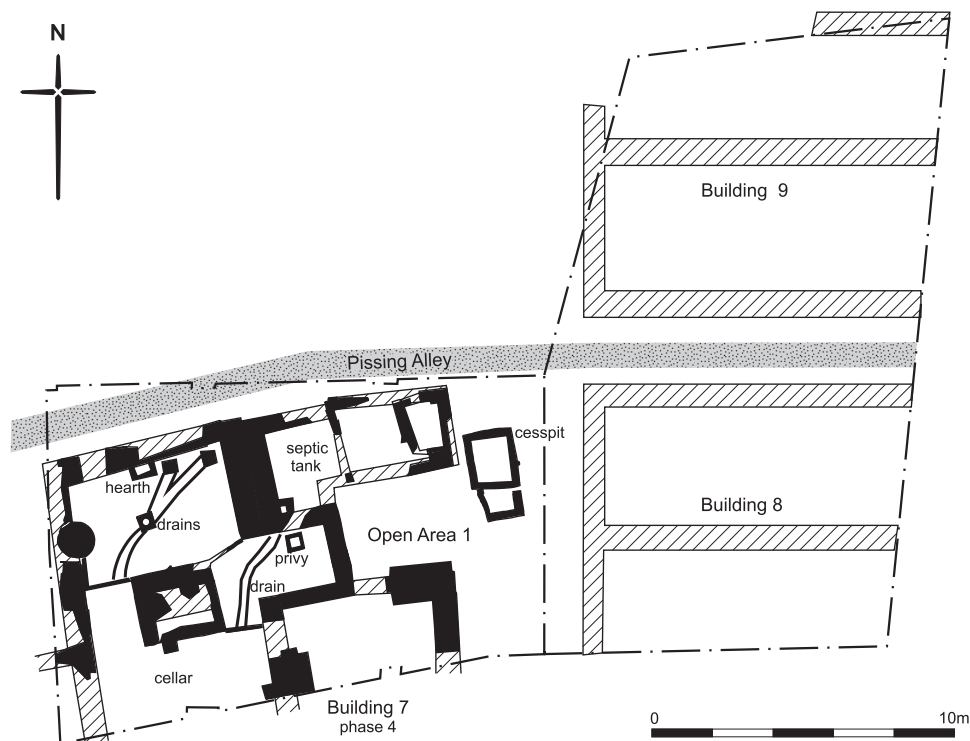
Plan of buildings at SAJ98 in c.1850 (scale 1:250)
